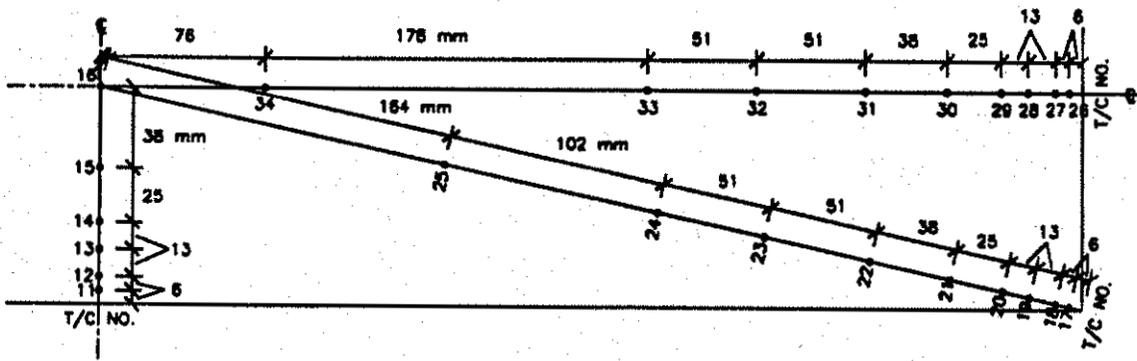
LOCATIONS OF T/C'S IN FRAMES: COLUMN NO. 4
